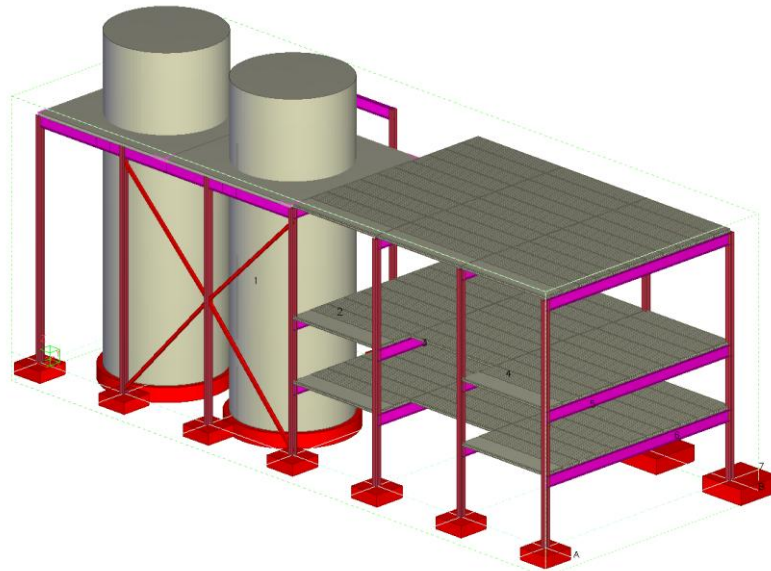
Construction of slabs on the beams (Structures, Tekla.)
